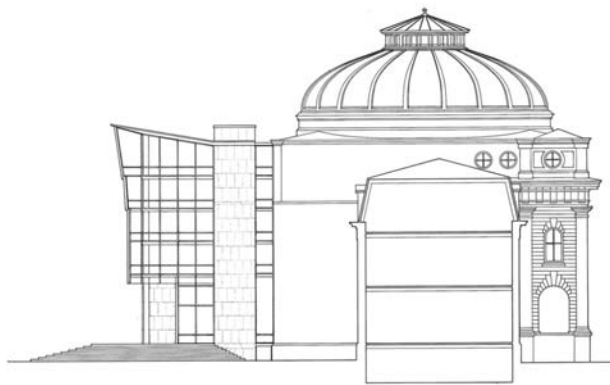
Section view, Schwartz/Silver glass structure addition to the north side of Sibley Hall dome.
